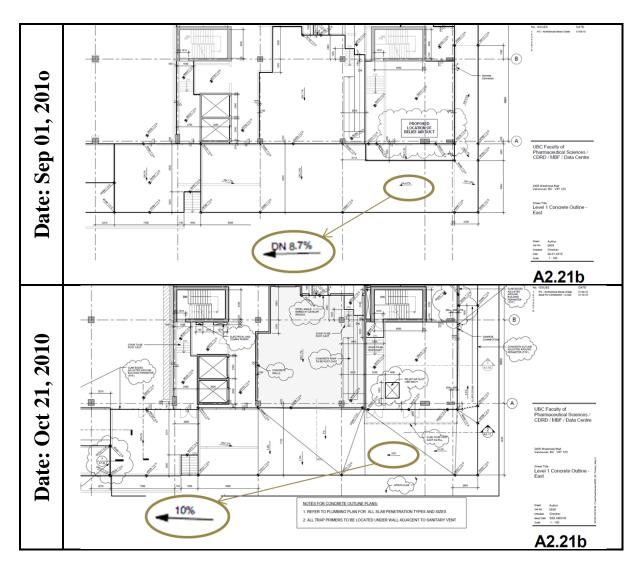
Change in the slope of concrete floor slab- Loading dock area
